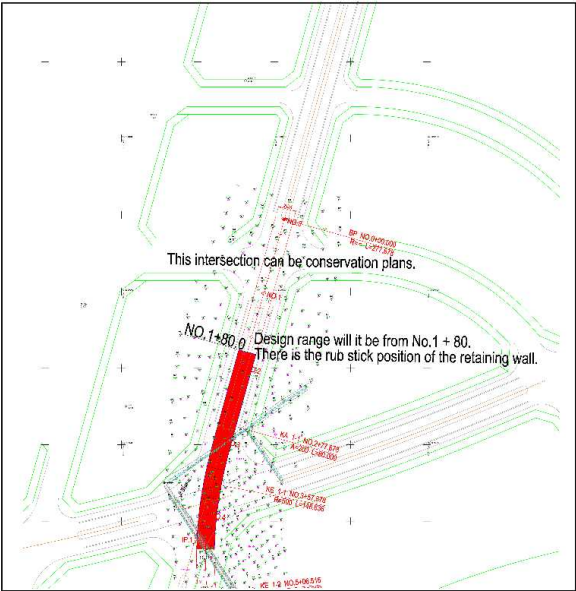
West Side of Nguyen Trai Road Widening Plan (W=41.5m)
